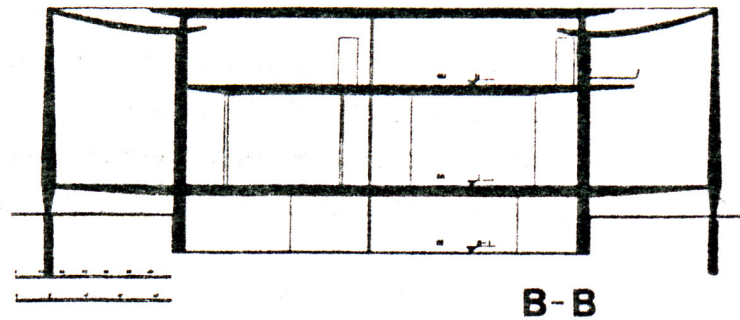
Palácio da Alvorada, Brasília, cross section.
